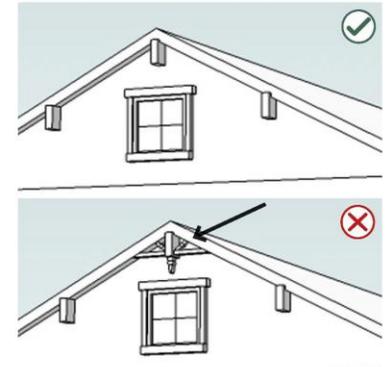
Do not add features that were not part of the historic structure. For example, decorative millwork shall not be added to a building if it was not a historic feature.
